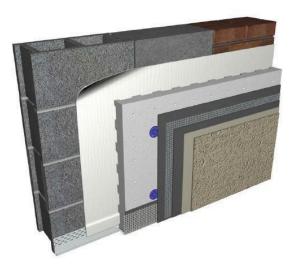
PUCCS EIFS over modified bituminous membrane on masonry, concrete, and brick
